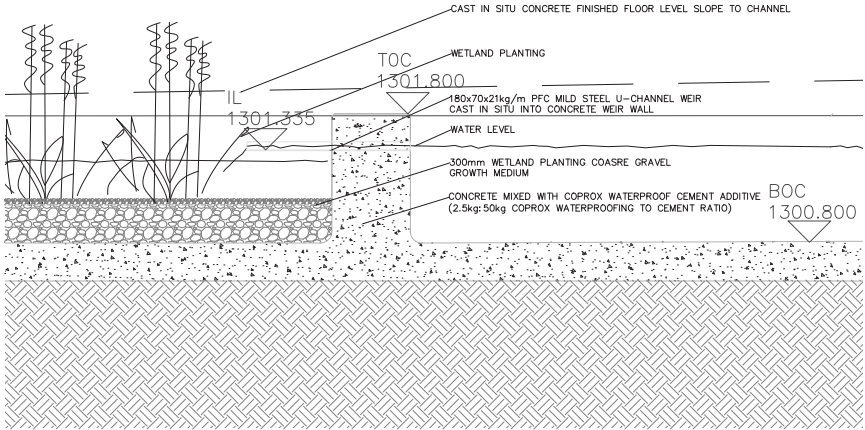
Detail 6-Water channel and wetland planting detail - not to scale (Author: 2013)
